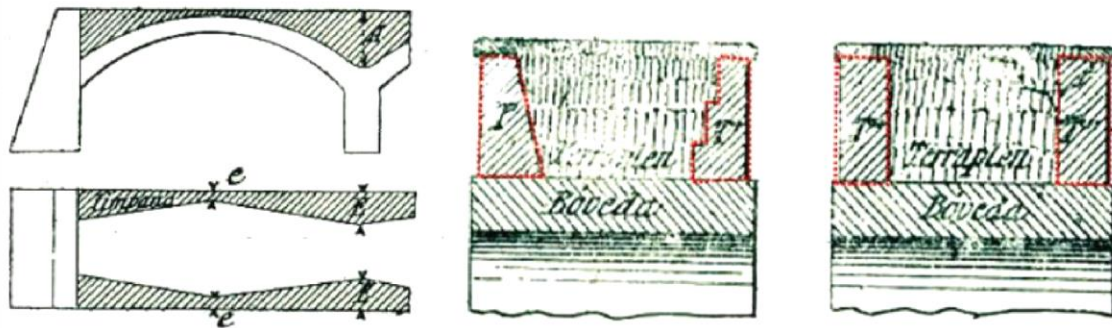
typical sections of spandrel walls (Ribera 1925-32).
